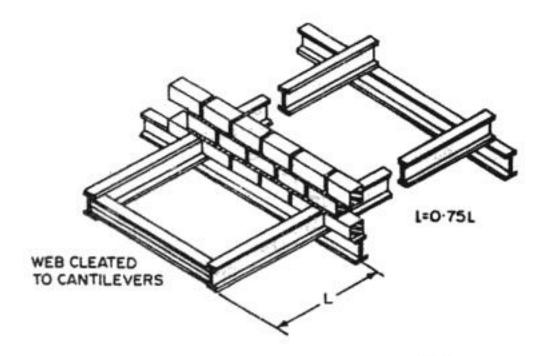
CANTILEVER BUILT-IN AT SUPPORT, RESTRAINED AGAINST TORSION AT THE END
